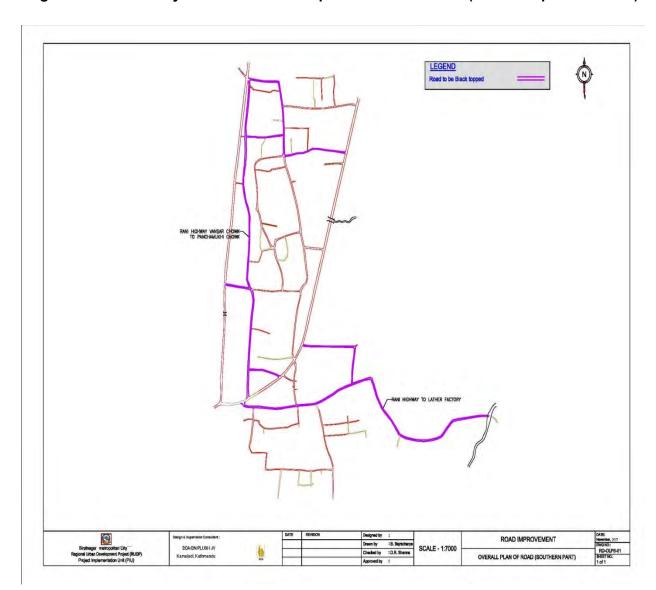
Overall Layout Plan of Road Improvement Networks (Southern part/rani area)
